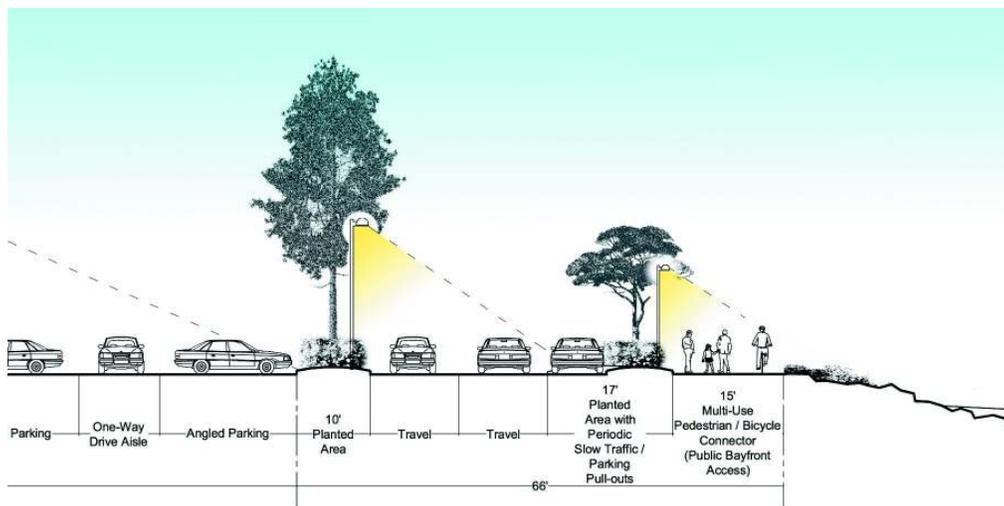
Mulford Point Drive (North Dike Road) - prototypical cross section, looking west
